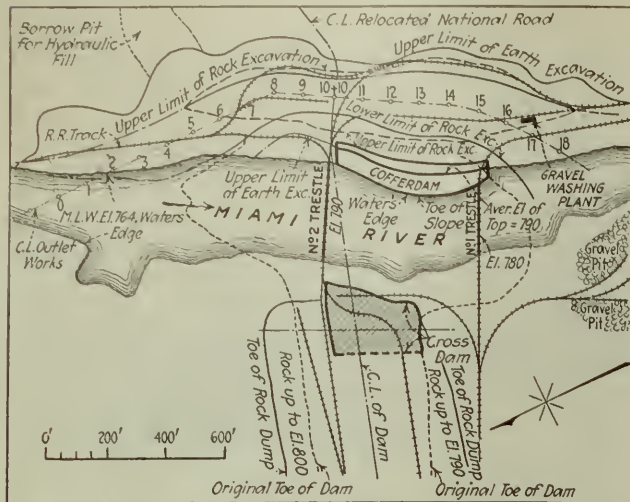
PLAN OF CHANNEL EXCAVATION OPERATION AT TAYLORSVILLE
